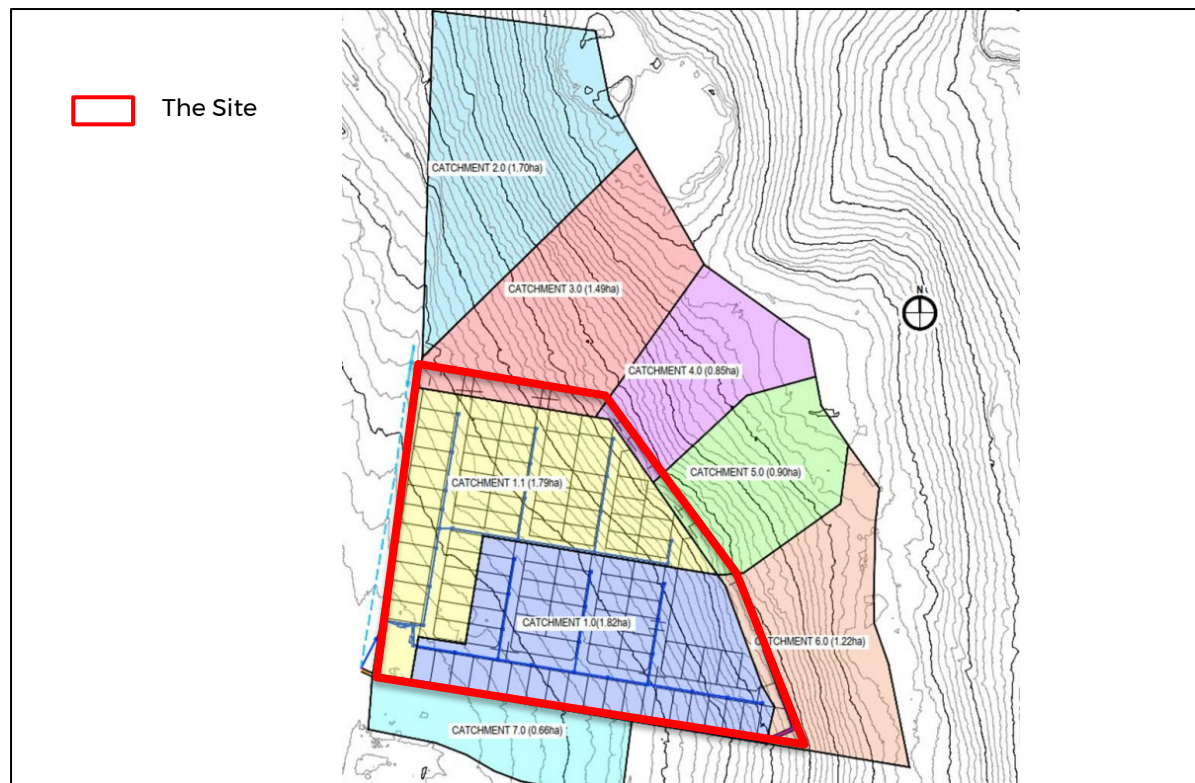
Post-development Stormwater Catchments (Source: King + Campbell, 2025)
